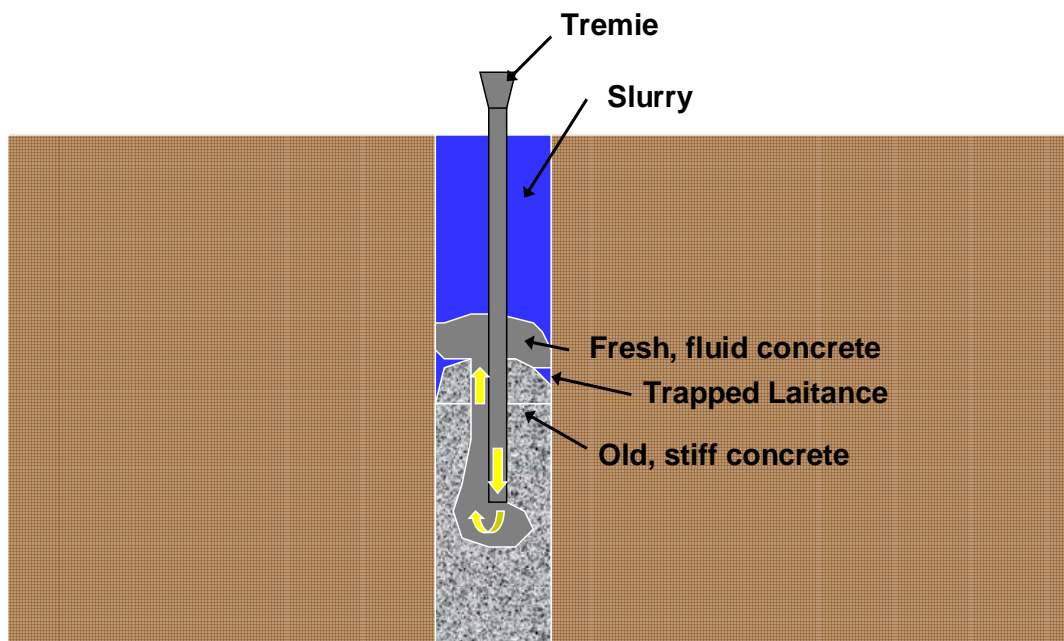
Schematic of Concrete “Vent” Due to Loss in Concrete Mix Workability During Tremie Placement
